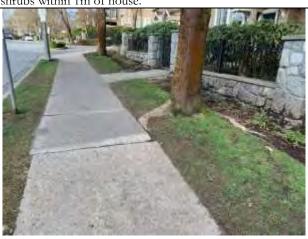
View of exposed roots heaving sidewalk. Root barrier and top dressing recommended.
